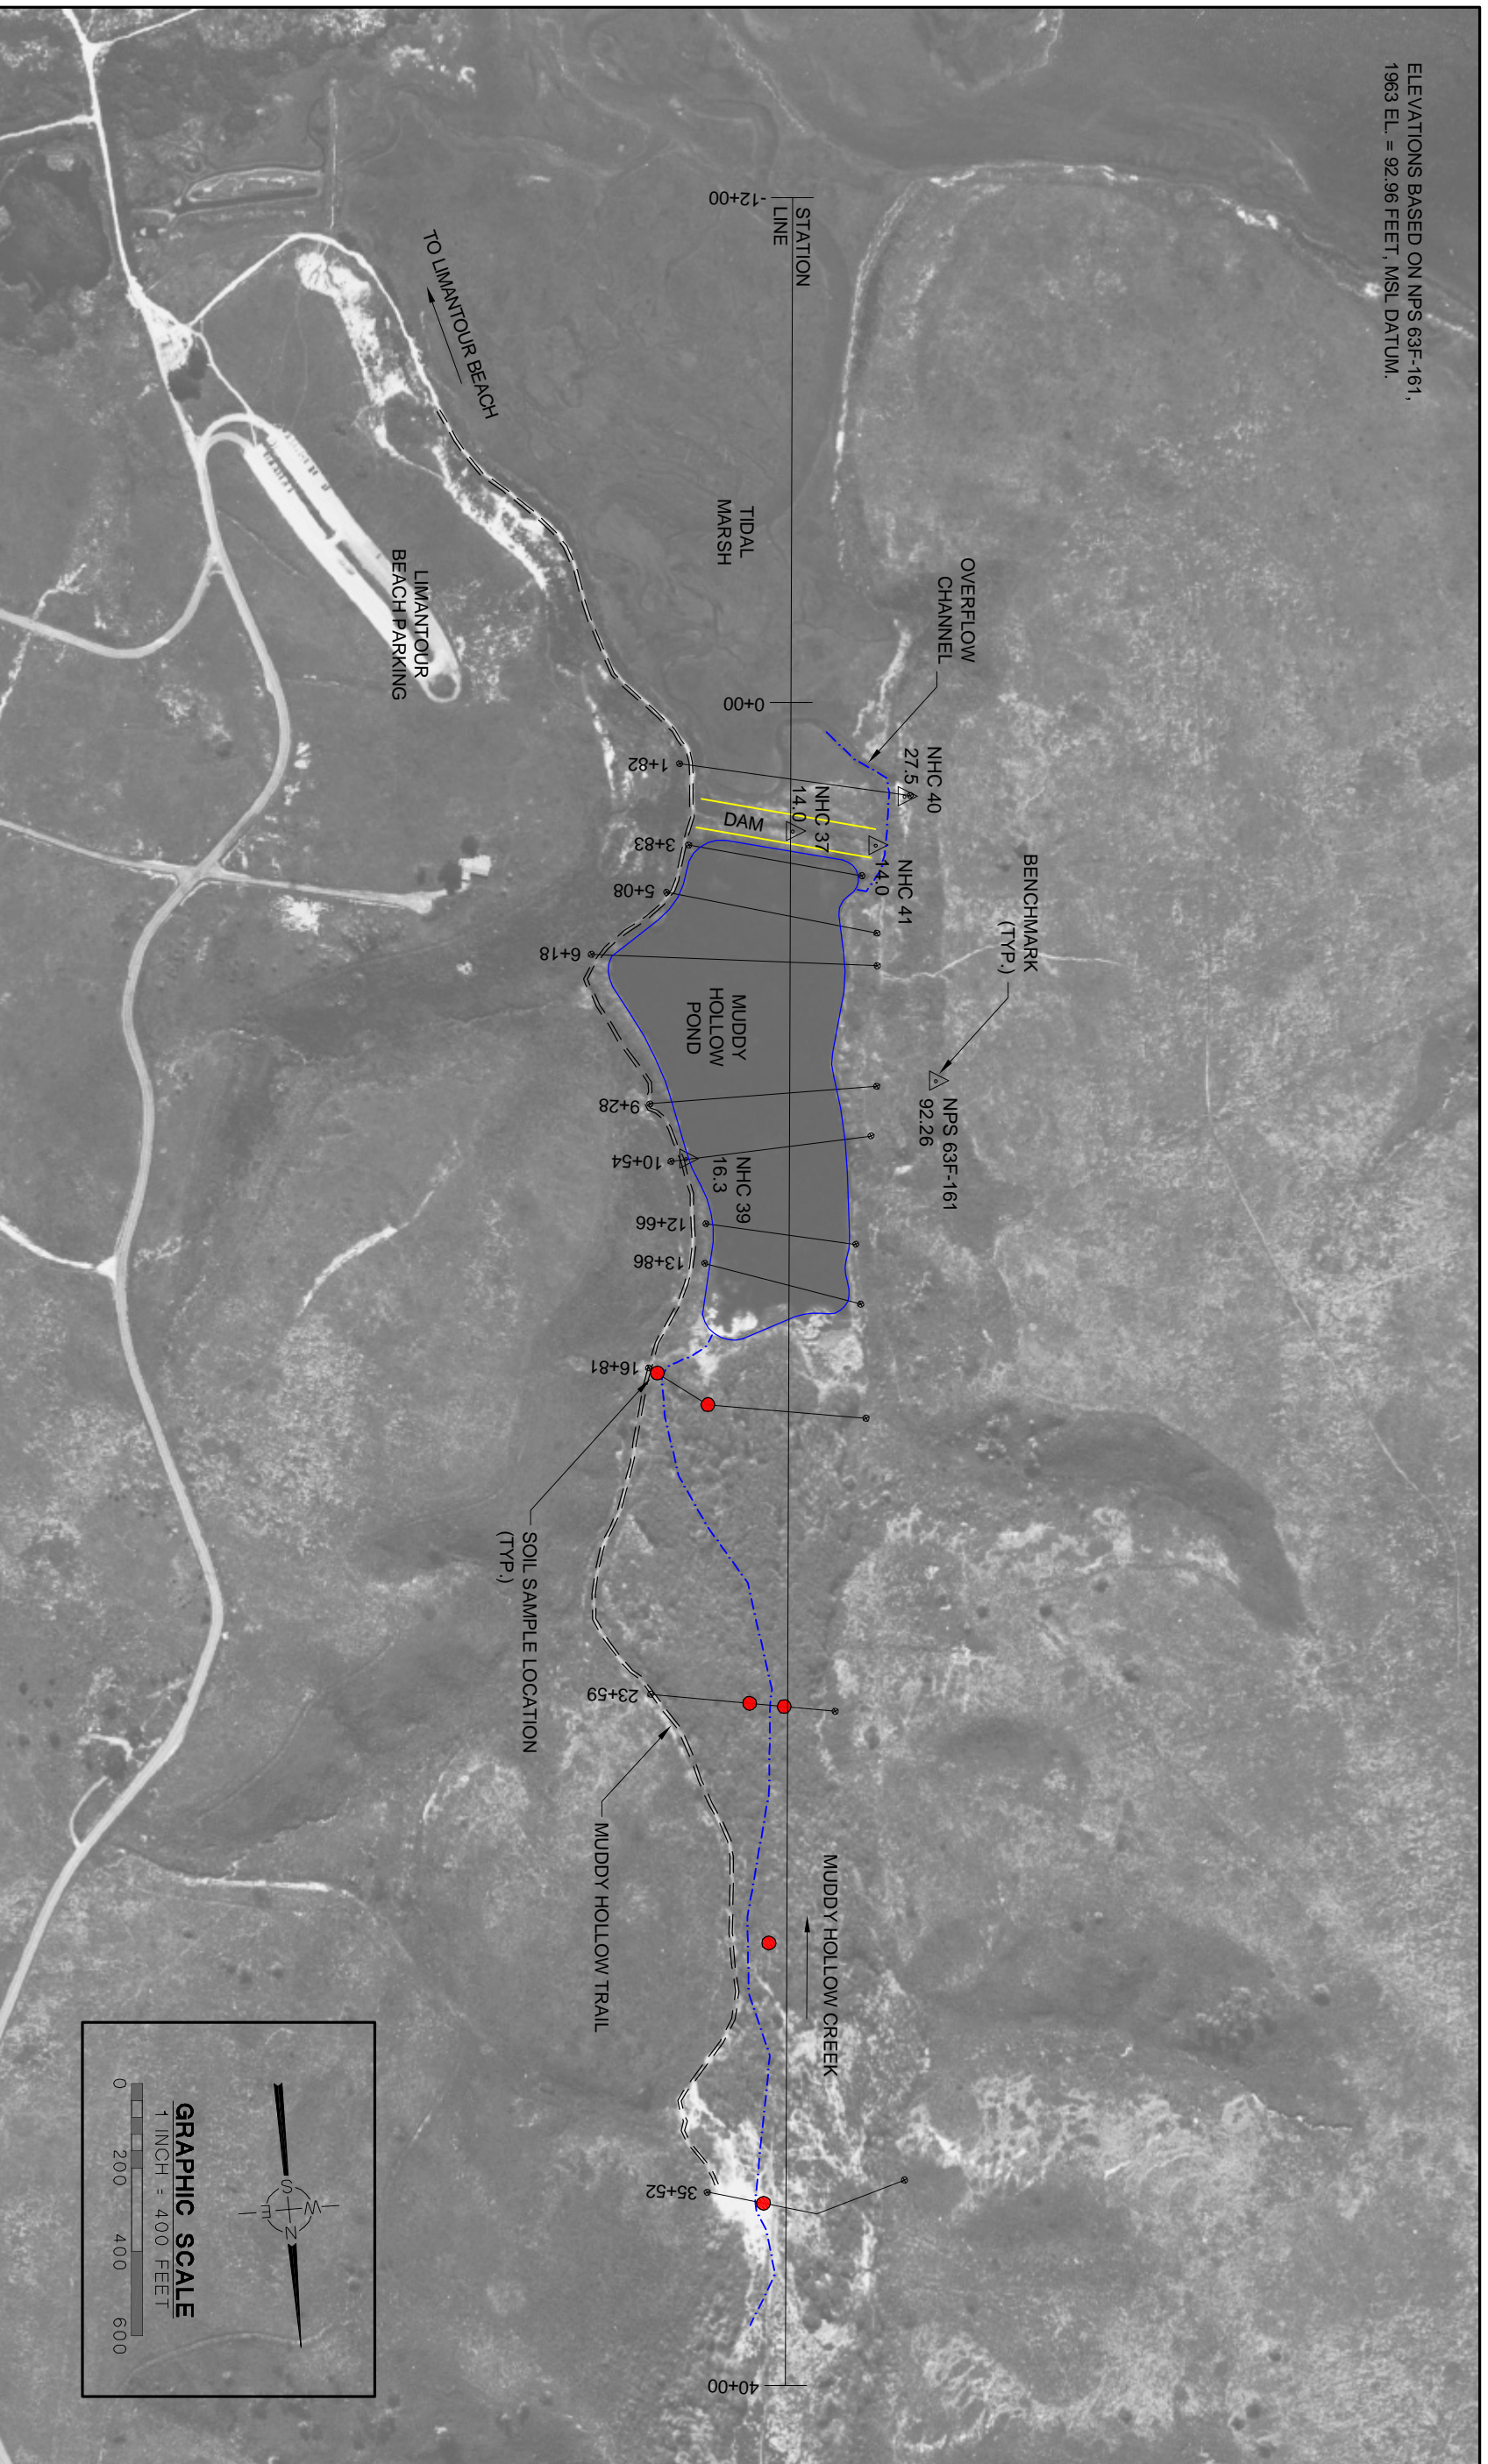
Muddy Hollow Creek Existing Conditions Site Plan
